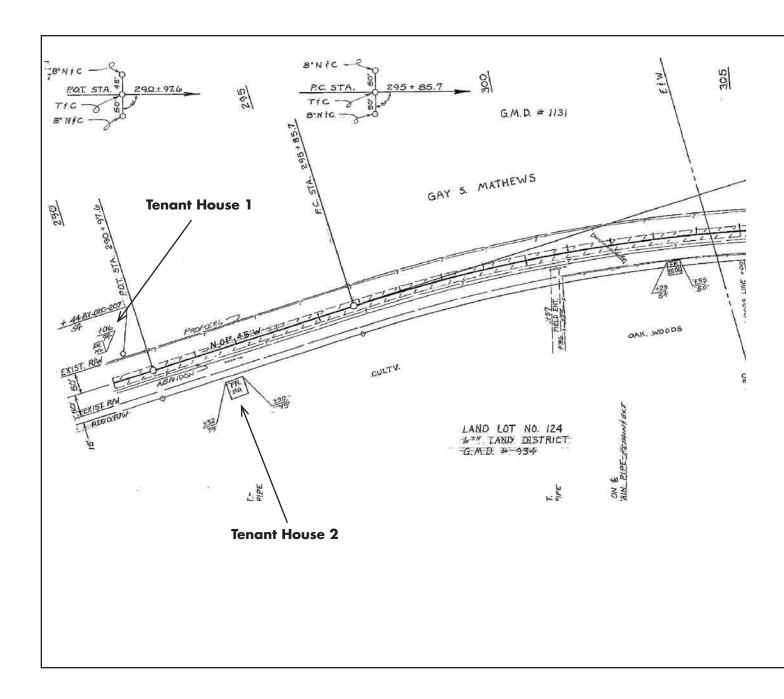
Proposed Improvements Plan, Showing Tenant House Locations along U.S. Highway 27 within L. E. Gay Plantation, 1987
